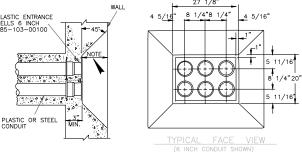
MANHOLE ENTRANCE WITH PLASTIC TERMINATORS (OLDER STYLE) FOR PLASTIC OR STEEL CONDUIT (POCKET TYPE)
